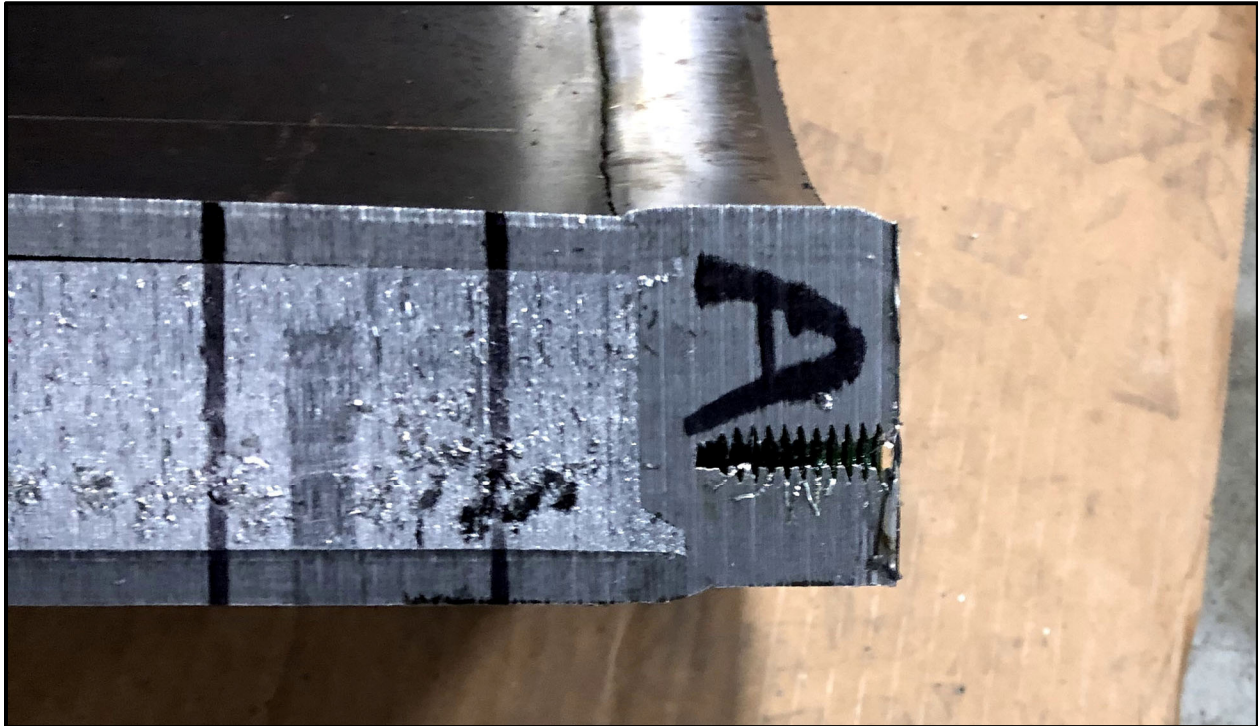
SC-30G2 18TU-02 Destructive Disassembly Cut A at Lower Flange
